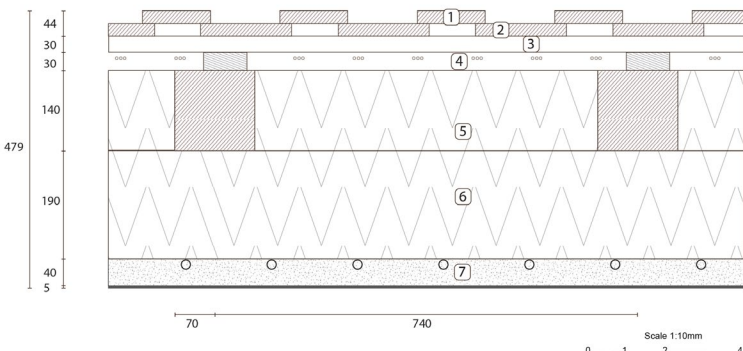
Upper-floor wall callout - Scale 1:100 (Author's drawing)
